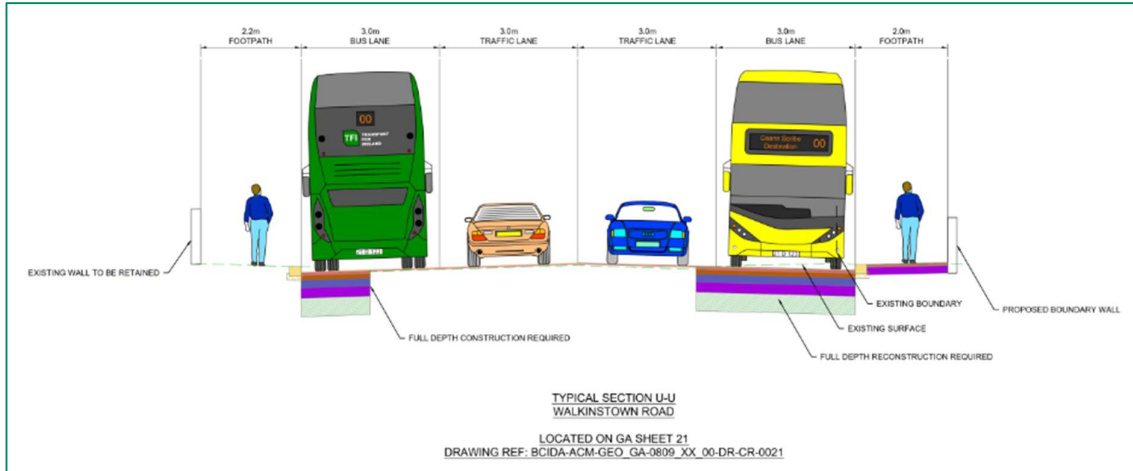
Typical Cross-section Adjacent to 27 Walkinstown Road
